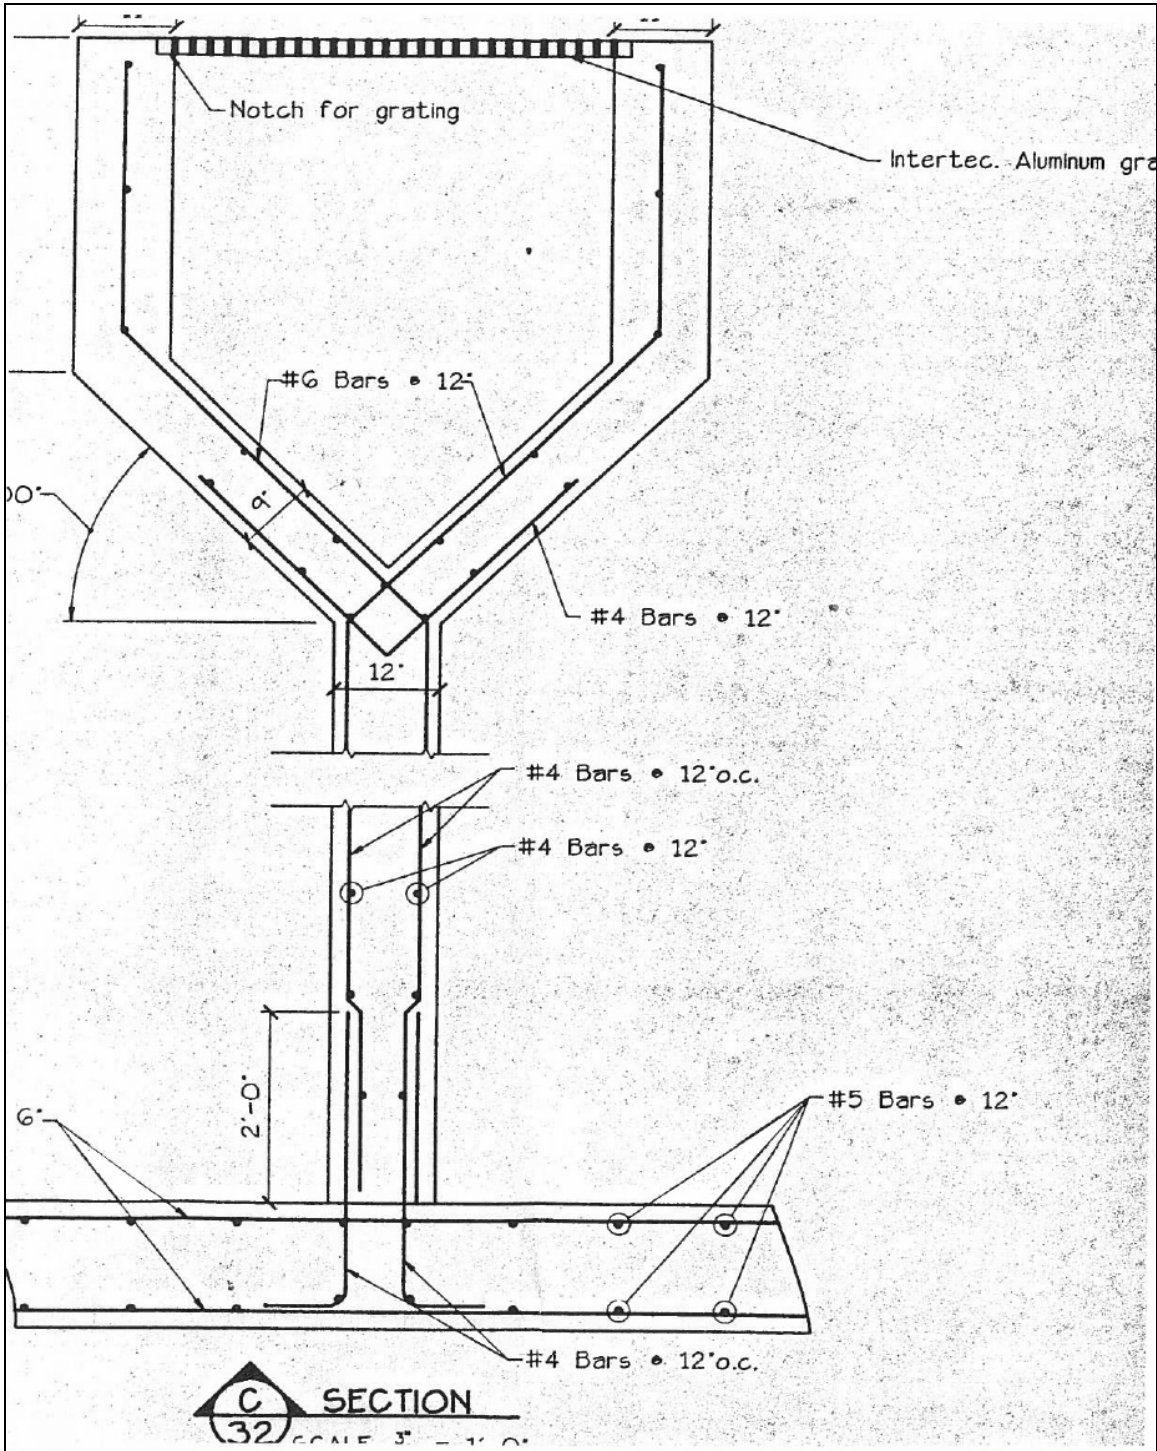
Vertical Section Showing Reinforcement for Interior Baffle Wall Connected to the East Wall
